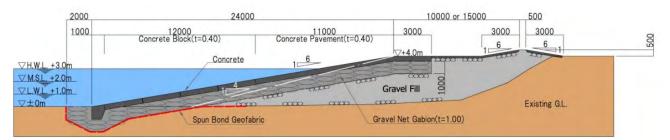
Typical Section and Plan of Proposed End Treatment Dike (Boat Ramp)
